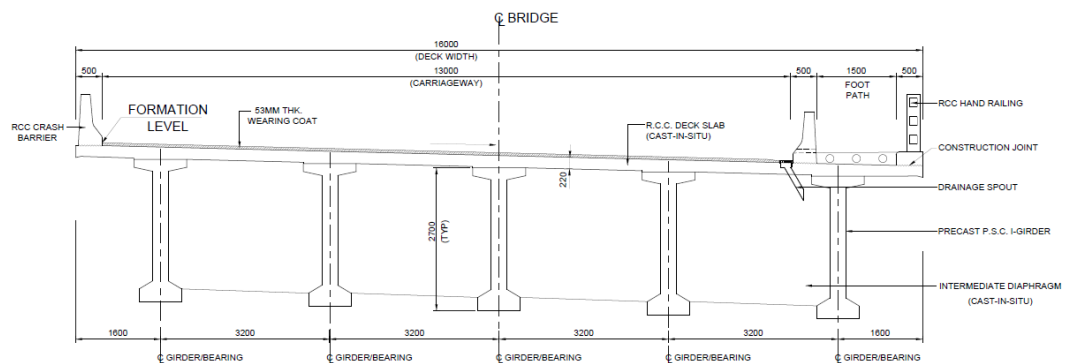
19 Cross section of 45m span OC post tensioned I girder at mid span
